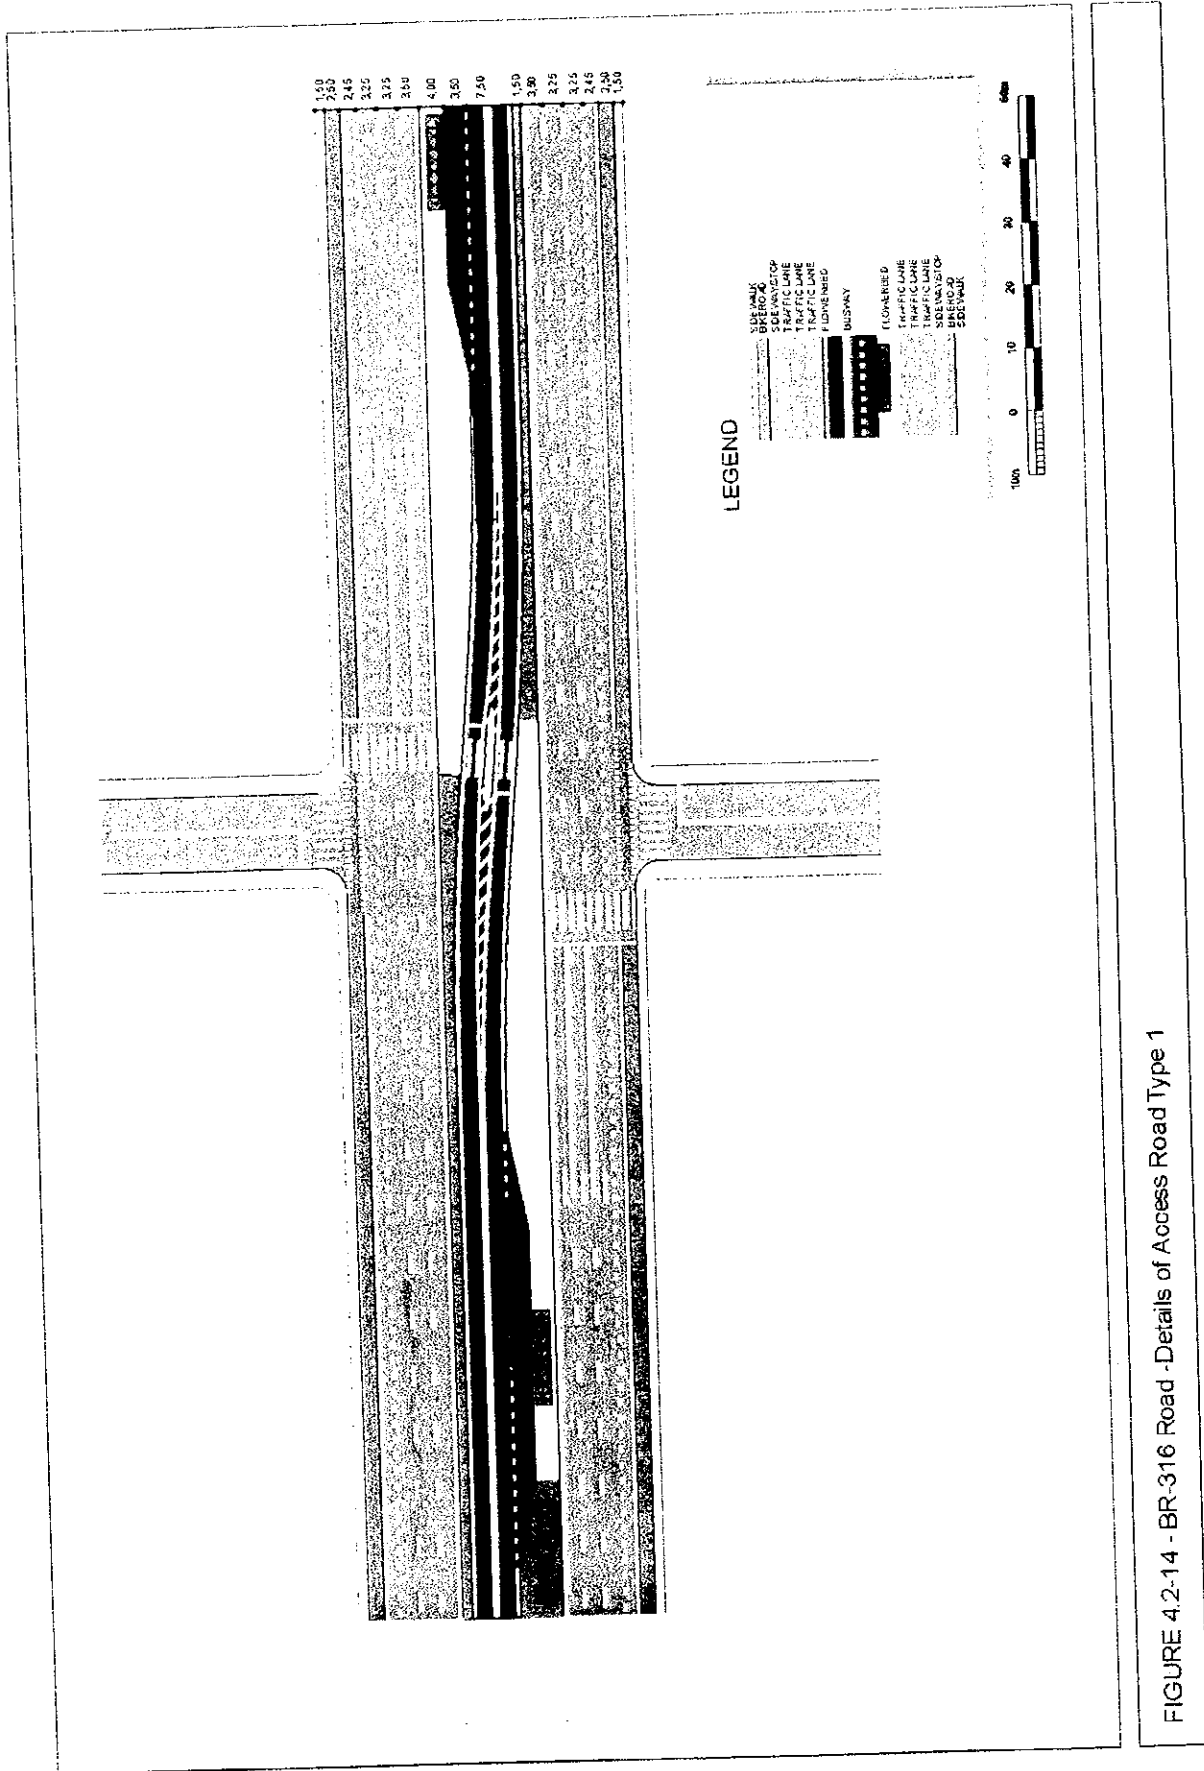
BR-316 Road -Details of Access Road Type 1
